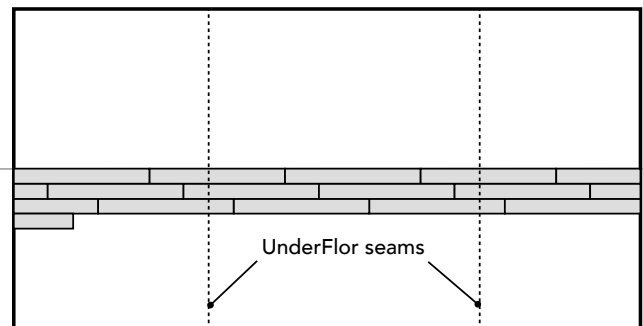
Install UnderFlor perpendicular to the long dimension of plank or rectangular tile flooring
